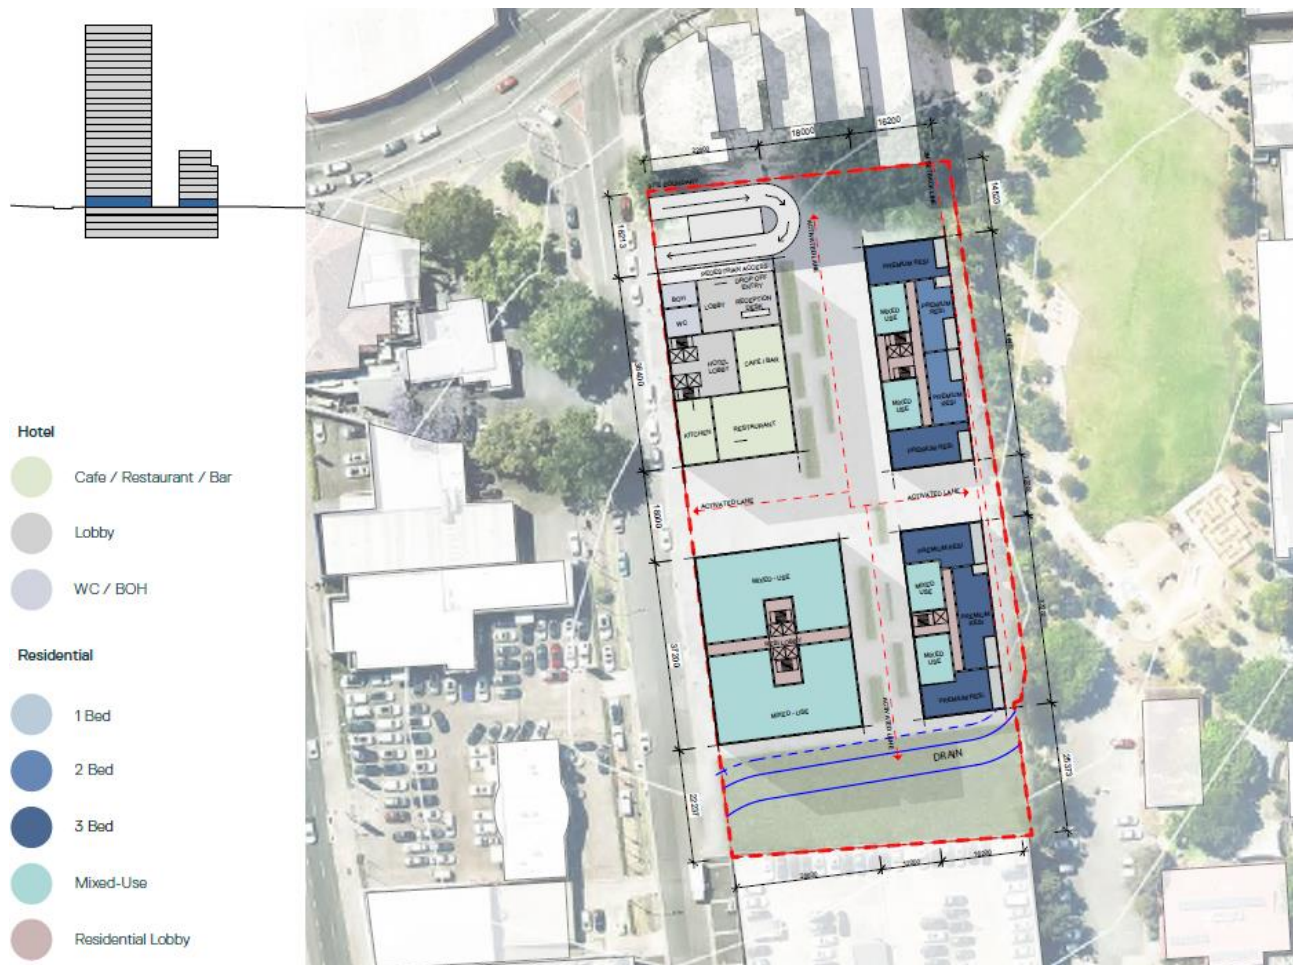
Proposed Site Plan (Grimshaw, May 2017)
